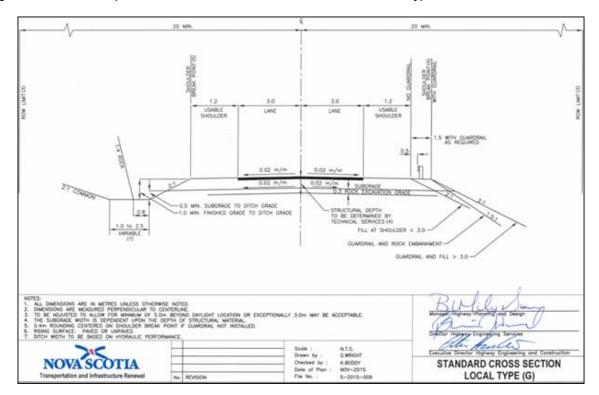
Transportation and Active Transit Standard Cross-section for Type G Gravel Road
